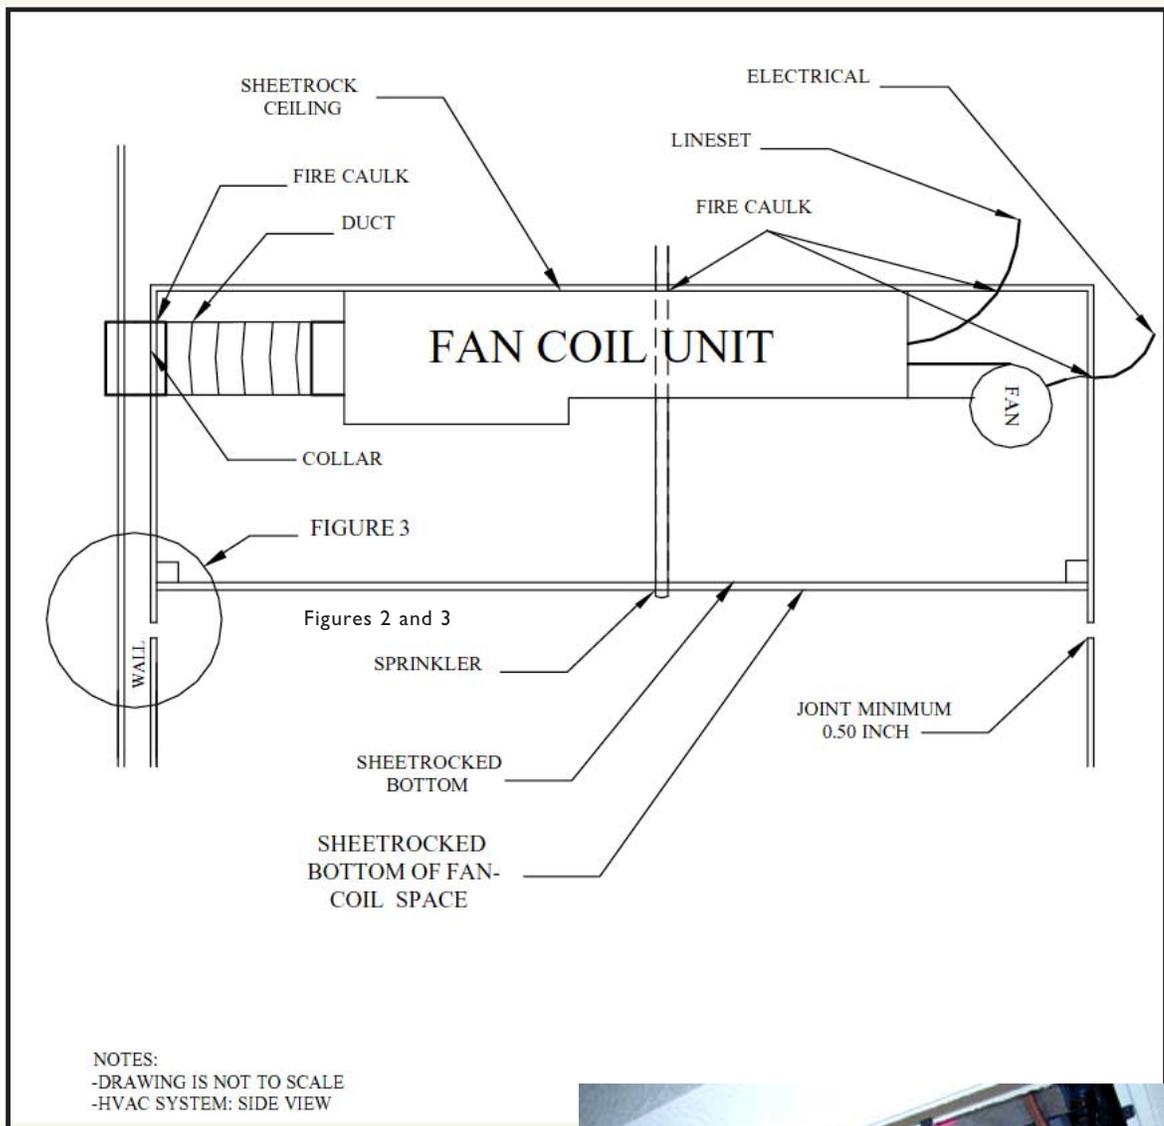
Cross-section drywall detail for fire code separation for multi-family, non-ducted ceiling returns for fan coil units.
